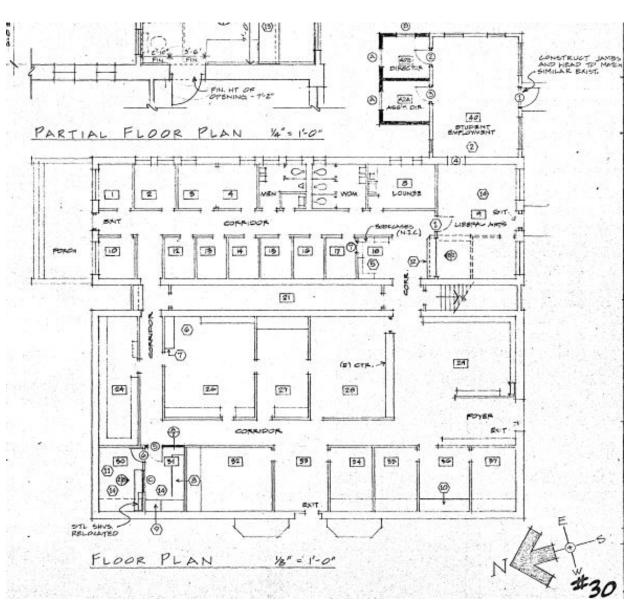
Floor plan of the subject building in 1977. Source: Stanford University.
